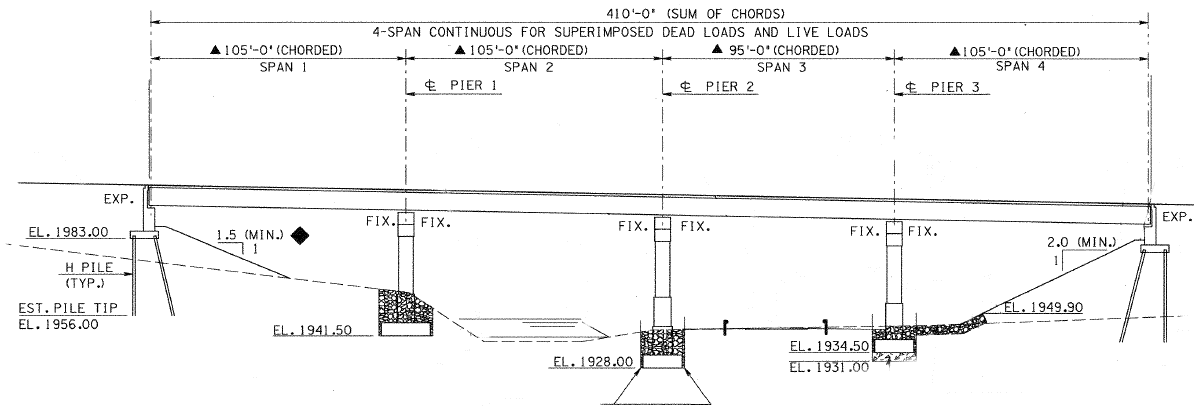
Elevation View of Horizontally Curved Bridge (PennDOT, 1996)
